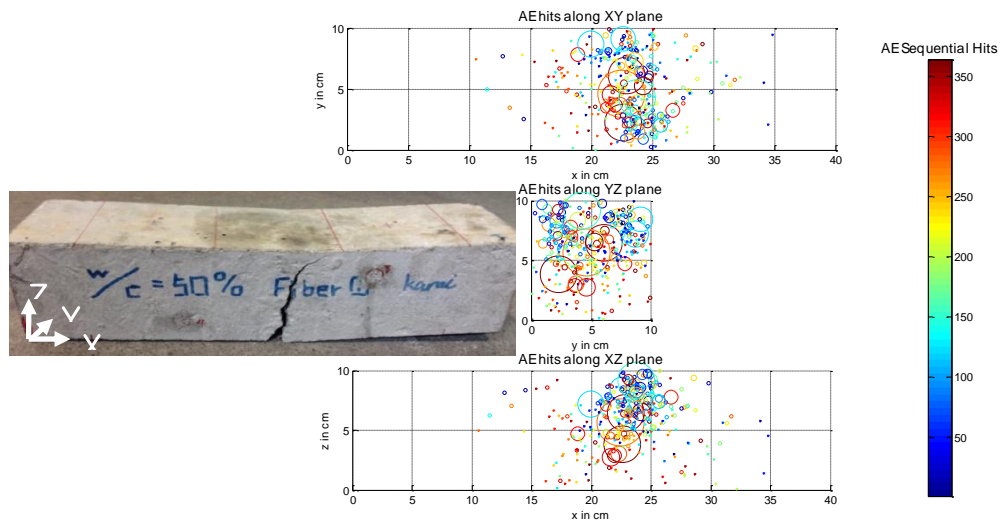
Short steel-fiber concrete beam with 100% AE hits
